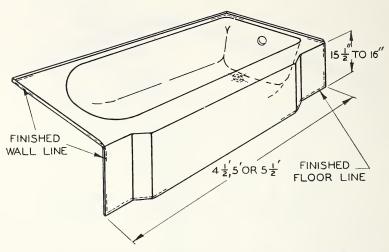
Recess double-shell bathtubs, right or left outlet. (See par. 4.4 (c) and fig. 2.)
